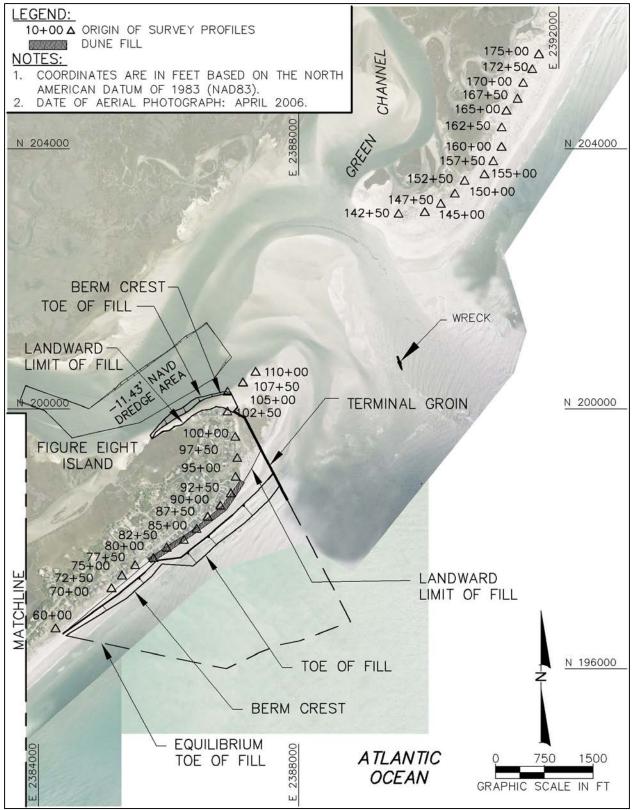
Plan View of Alternative 5B; 2006 shoreline conditions.
